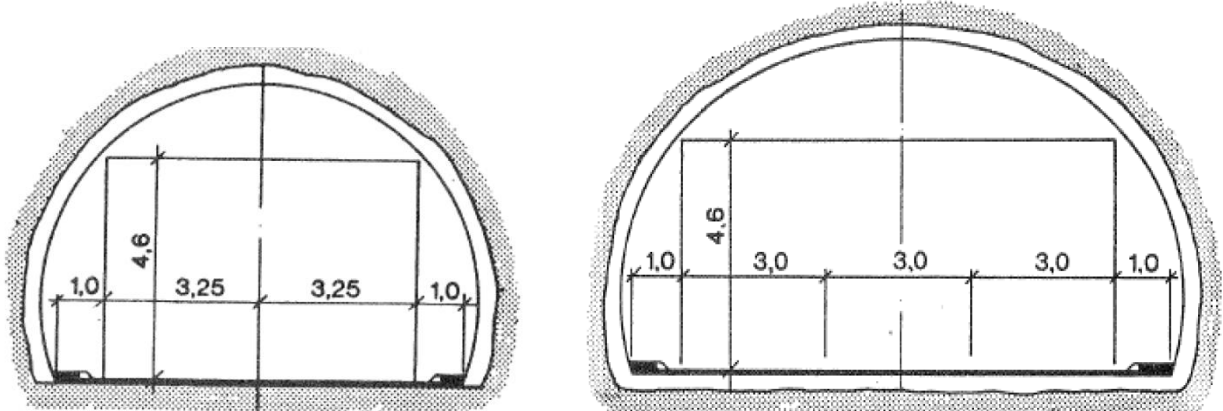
Principal lay-out of cross section of tunnel (unit: m).
